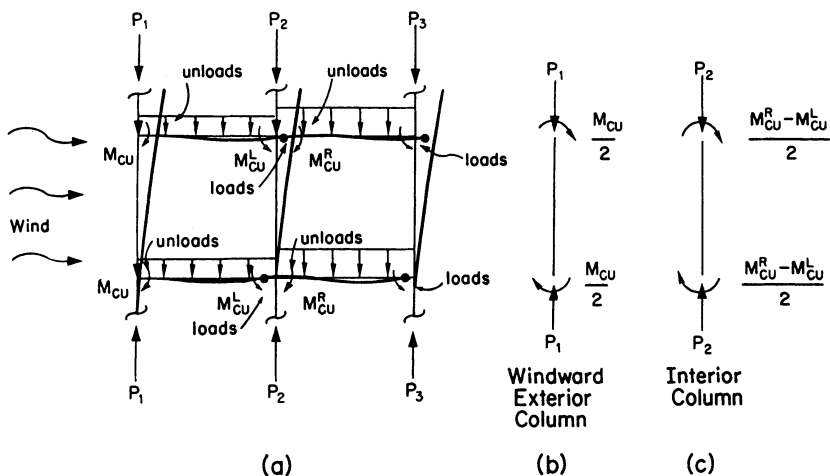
Design of exterior and interior columns in a sway permitted frame
